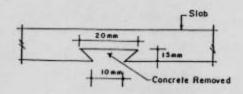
Grove to be made for repair of cracks in ceiling
